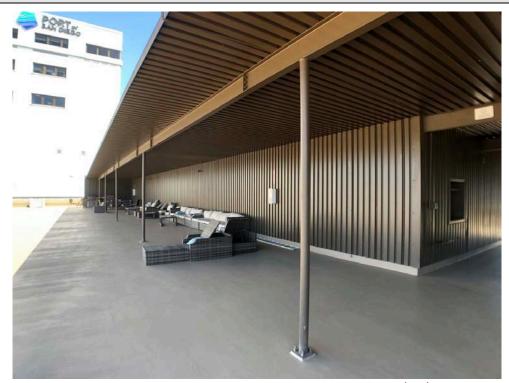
Rooftop Lounge. Facing north. Photo taken 11/12/2020.
